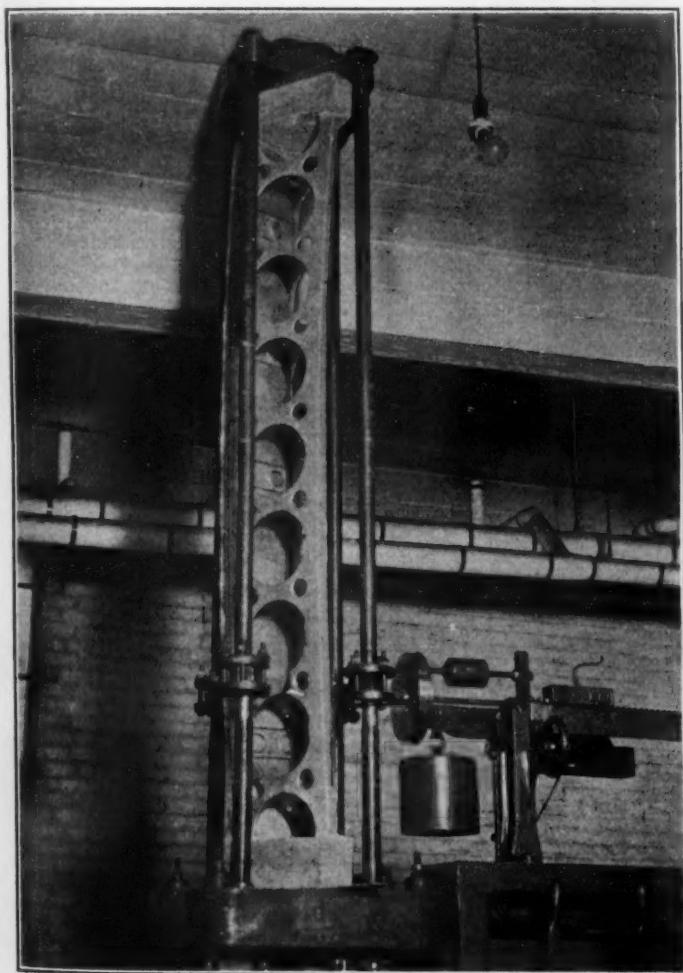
SECTION OF A TRANSVERSE GIRDER UNDER TEST
